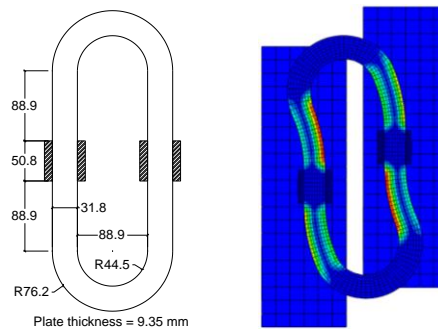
Dimensions of an o-connector and its deformed shape demonstrated by a finite element model (1 mm = 0.0394 in.).
